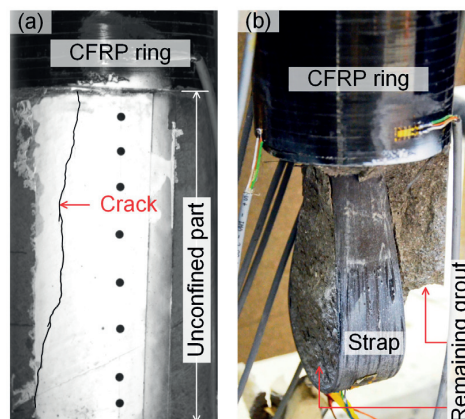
Failure mode of anchor C200: (a) vertical grout crack at around 250 kN; (b) splitting failure of unconfined grout around embedded strap
